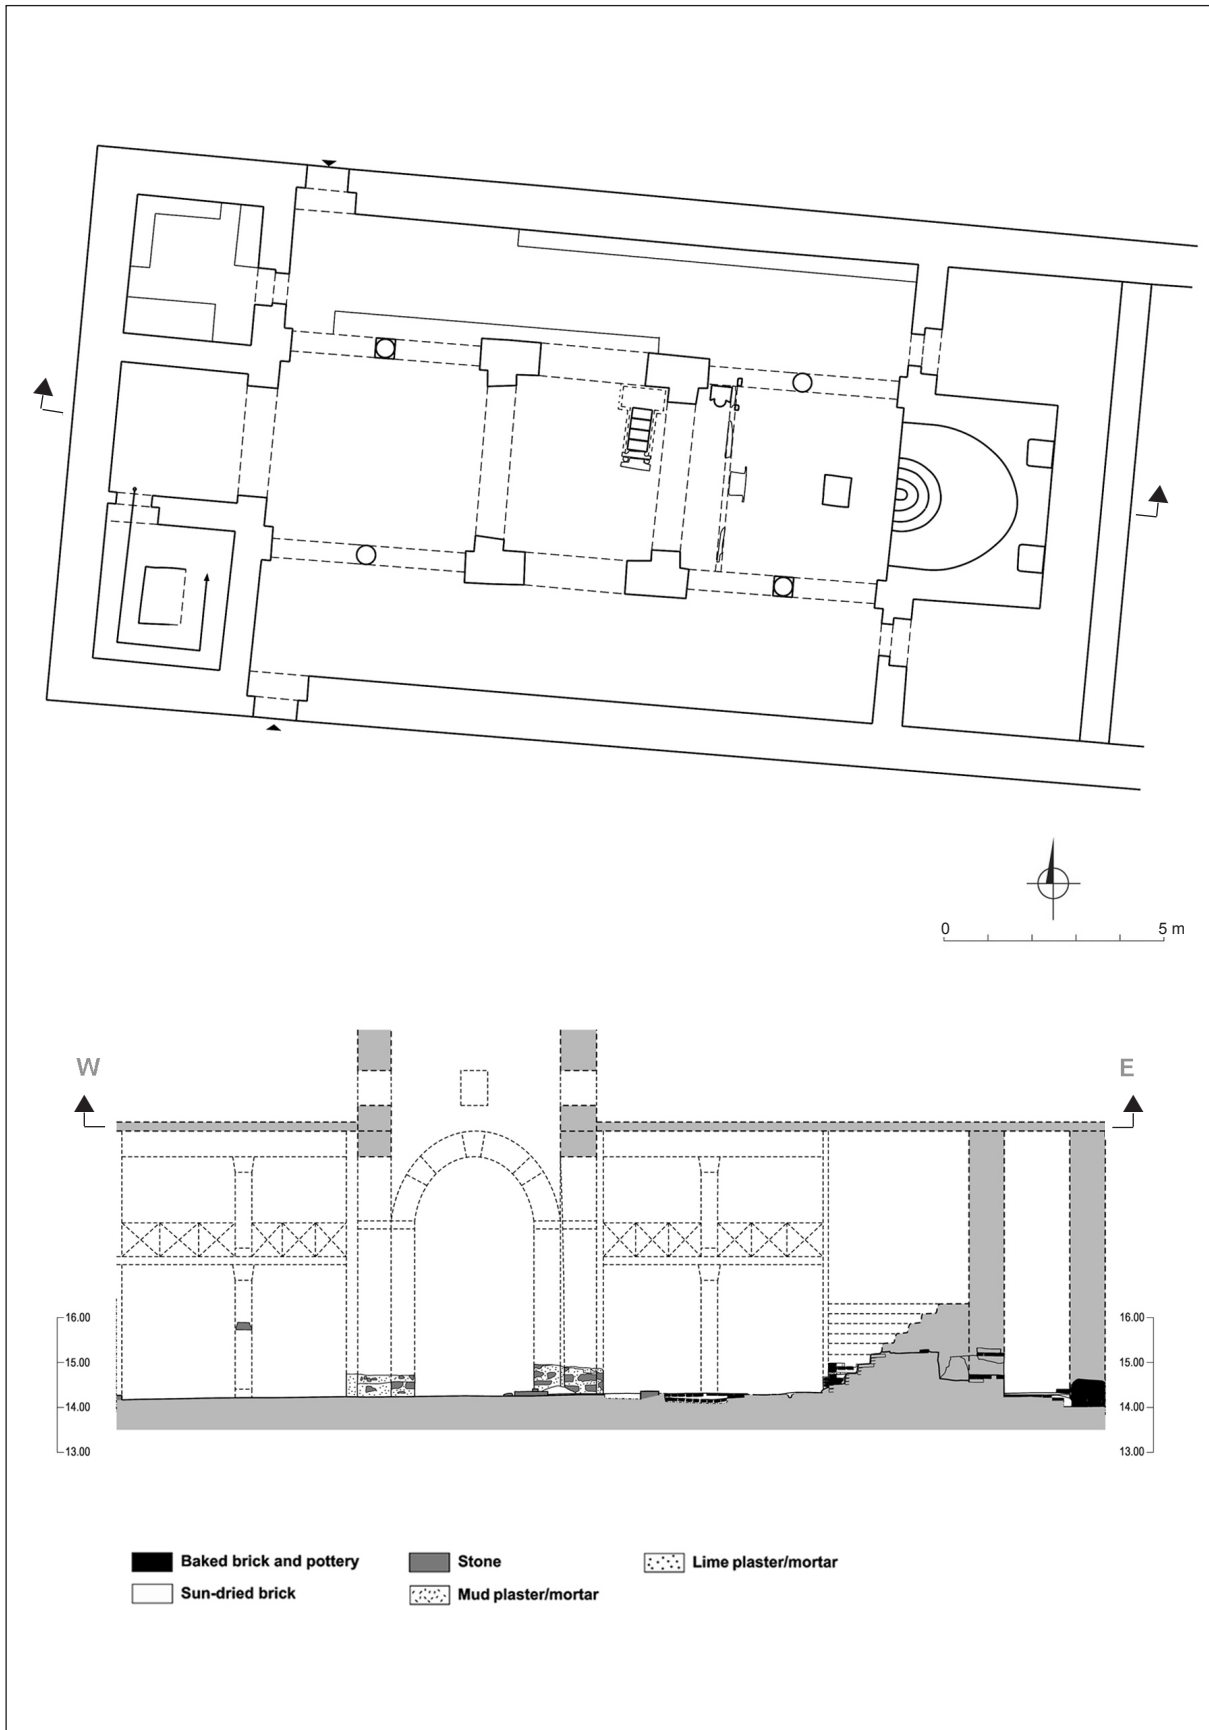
Monastery Church: top, original plan of the church from the mid-6th century AD; bottom, east-west section through the early naos, looking north
